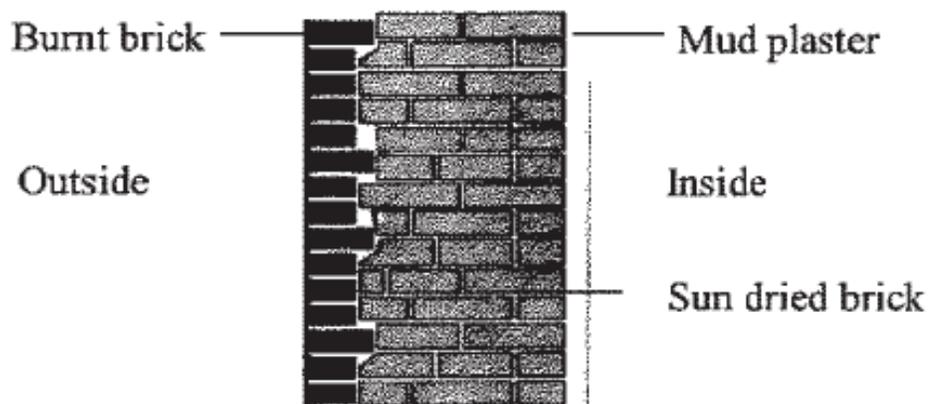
Wall Section of Traditional House (Source: Korn, 1976)
